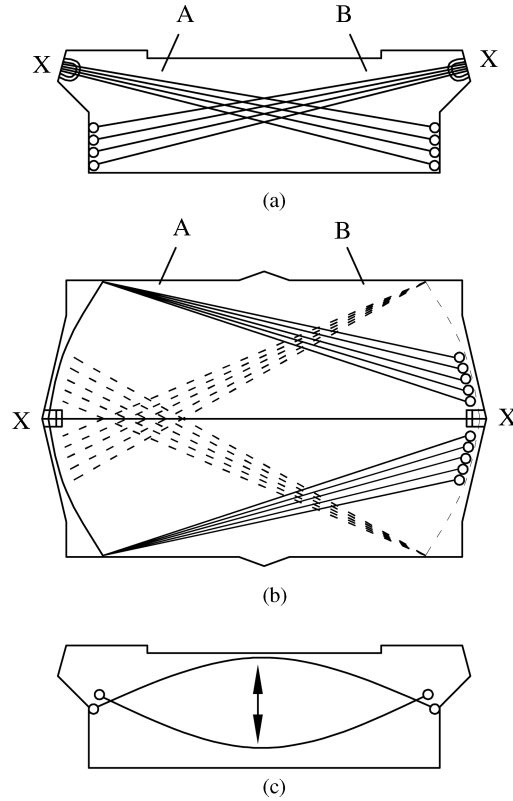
C.12 Part of pre-stressed concrete hammer foundation showing stressing ducts.
